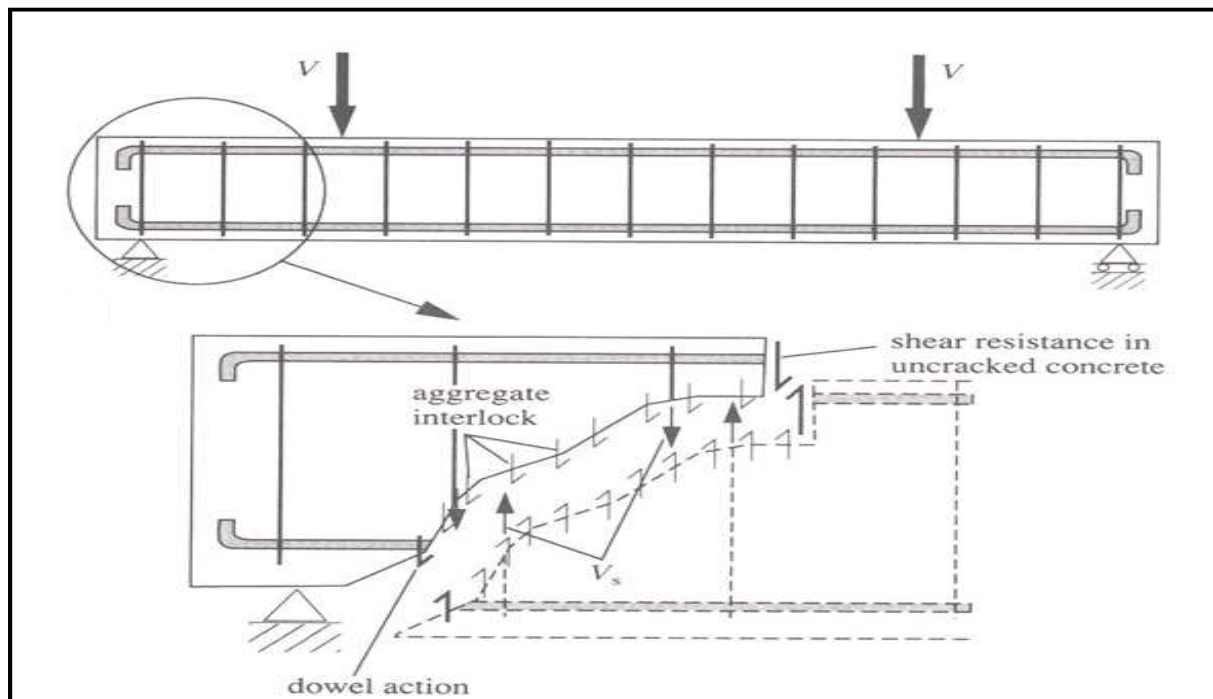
Shear resistance of member with stirrups. Elevation showing reinforcement (*top*) and transfer of shear force through the member (*bottom*) . (O'Brien & Dixon, 1995)
